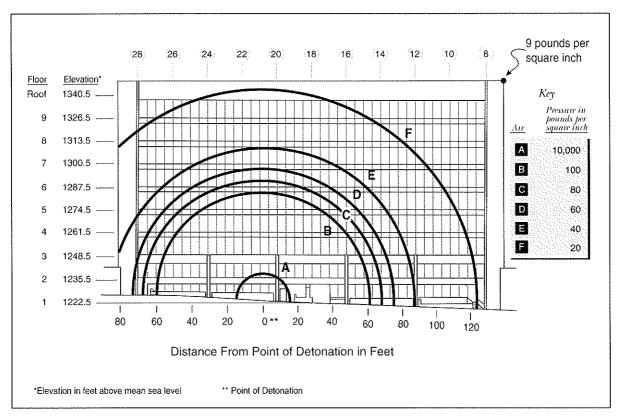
Peak overpressures on north elevation of nine-story portion of Murrah Building.
